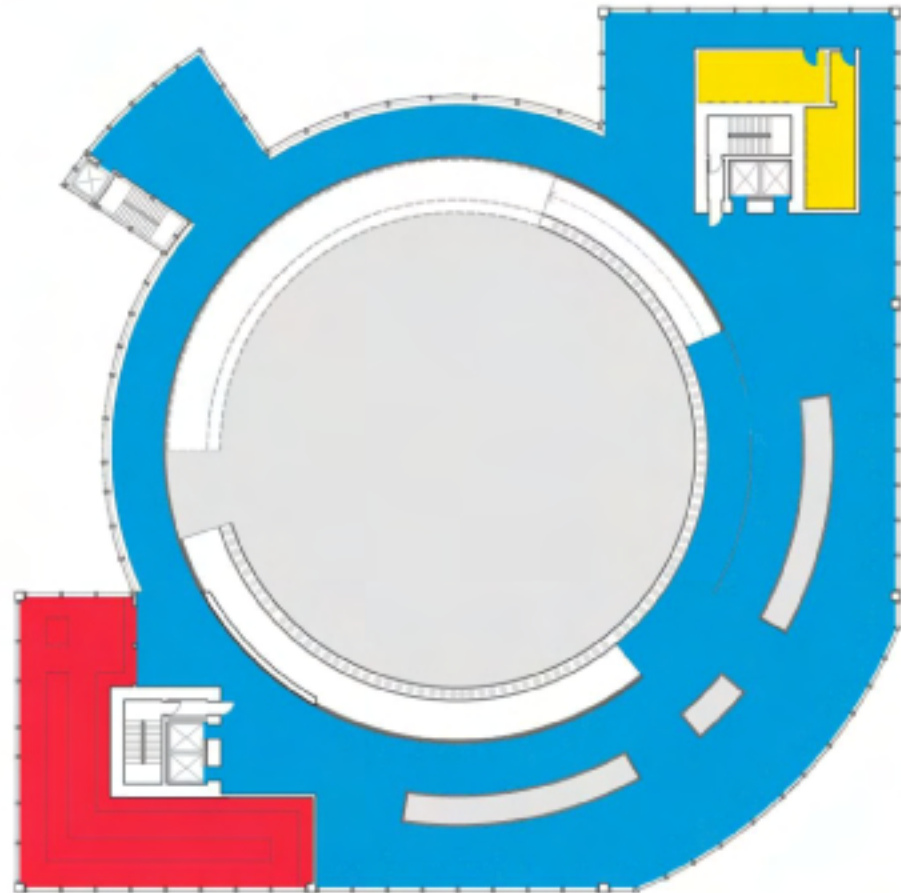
Aerial view with site in context [Revit]. Above is plan key for floor plan two.
